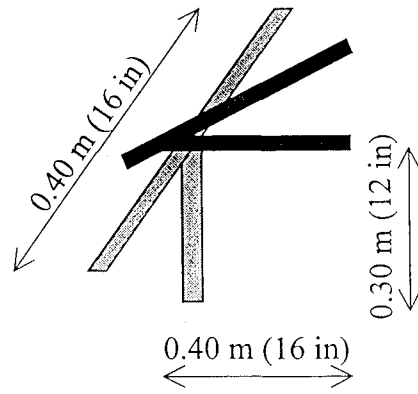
Component Test Specimens for Wall-to-Roof Connections
